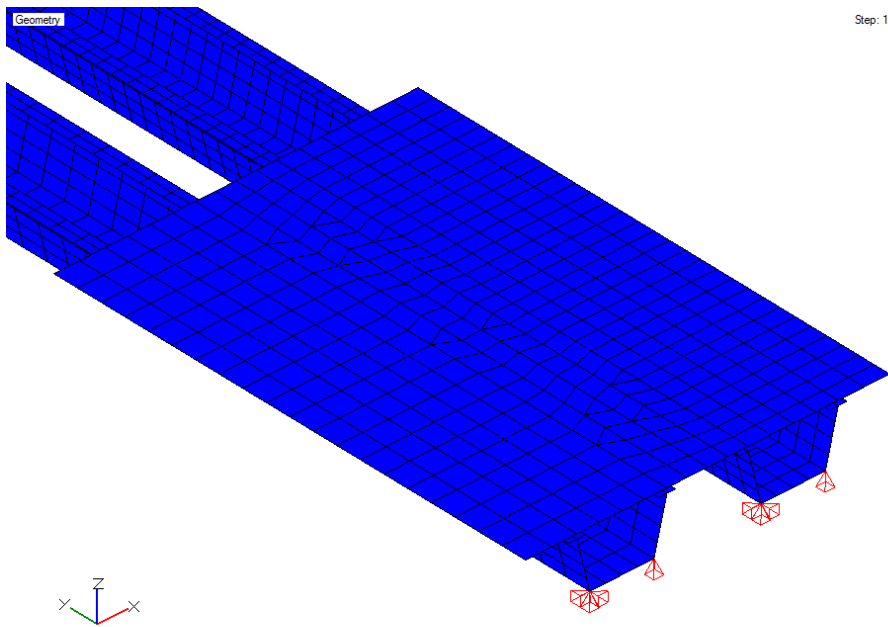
Deck meshing on a curved, twin tub girder bridge
